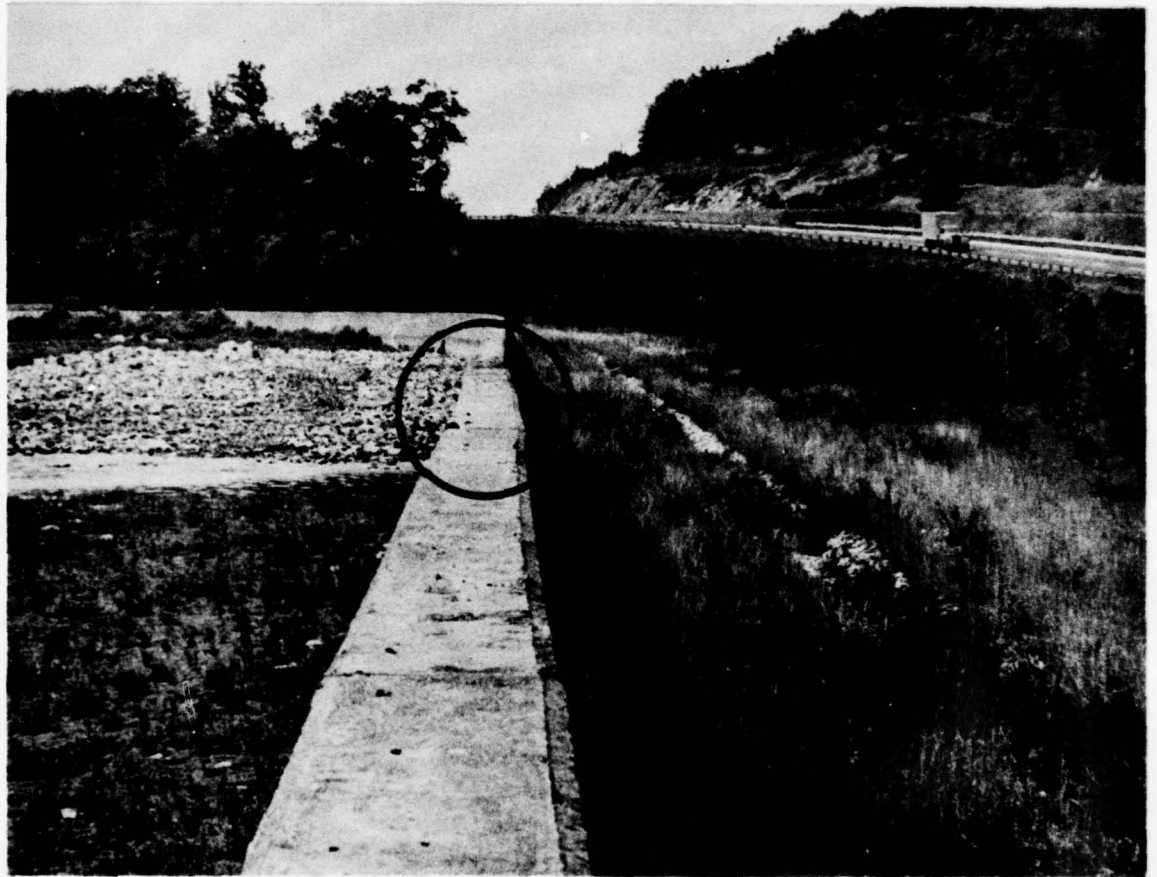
View of top of wall looking west showing horizontal misalignment of monolith. (Photo taken August 3, 1978).
